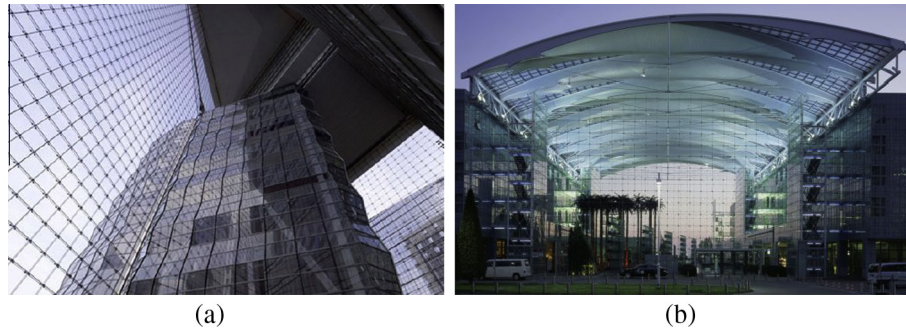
Examples of two-way straight cable-net façades. (a) New Beijing Poly Plaza Cable-Net Wall [9] and (b) Kempinski Hotel at Munich Airport [10].
